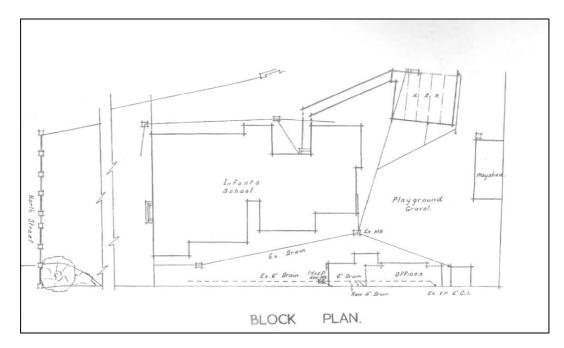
Block plan for alterations of toilet block or 'offices' dated November 1949
